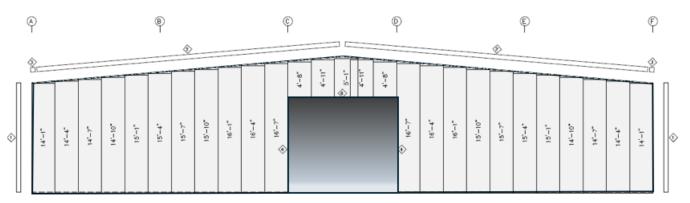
Exhibit E: Concept Manufacturing Building to be Constructed
